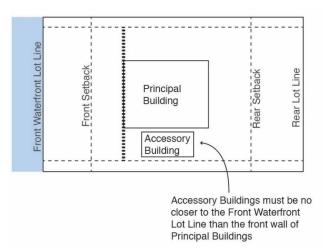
Accessory Building Front Setback Illustration (RM-1 front waterfront)
